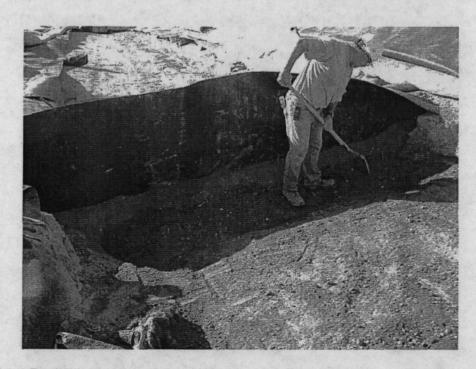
Backfilling of membrane cutoff trench (Note flap was folded down gradient and seamed to adjoining liner), August 29, 2001
